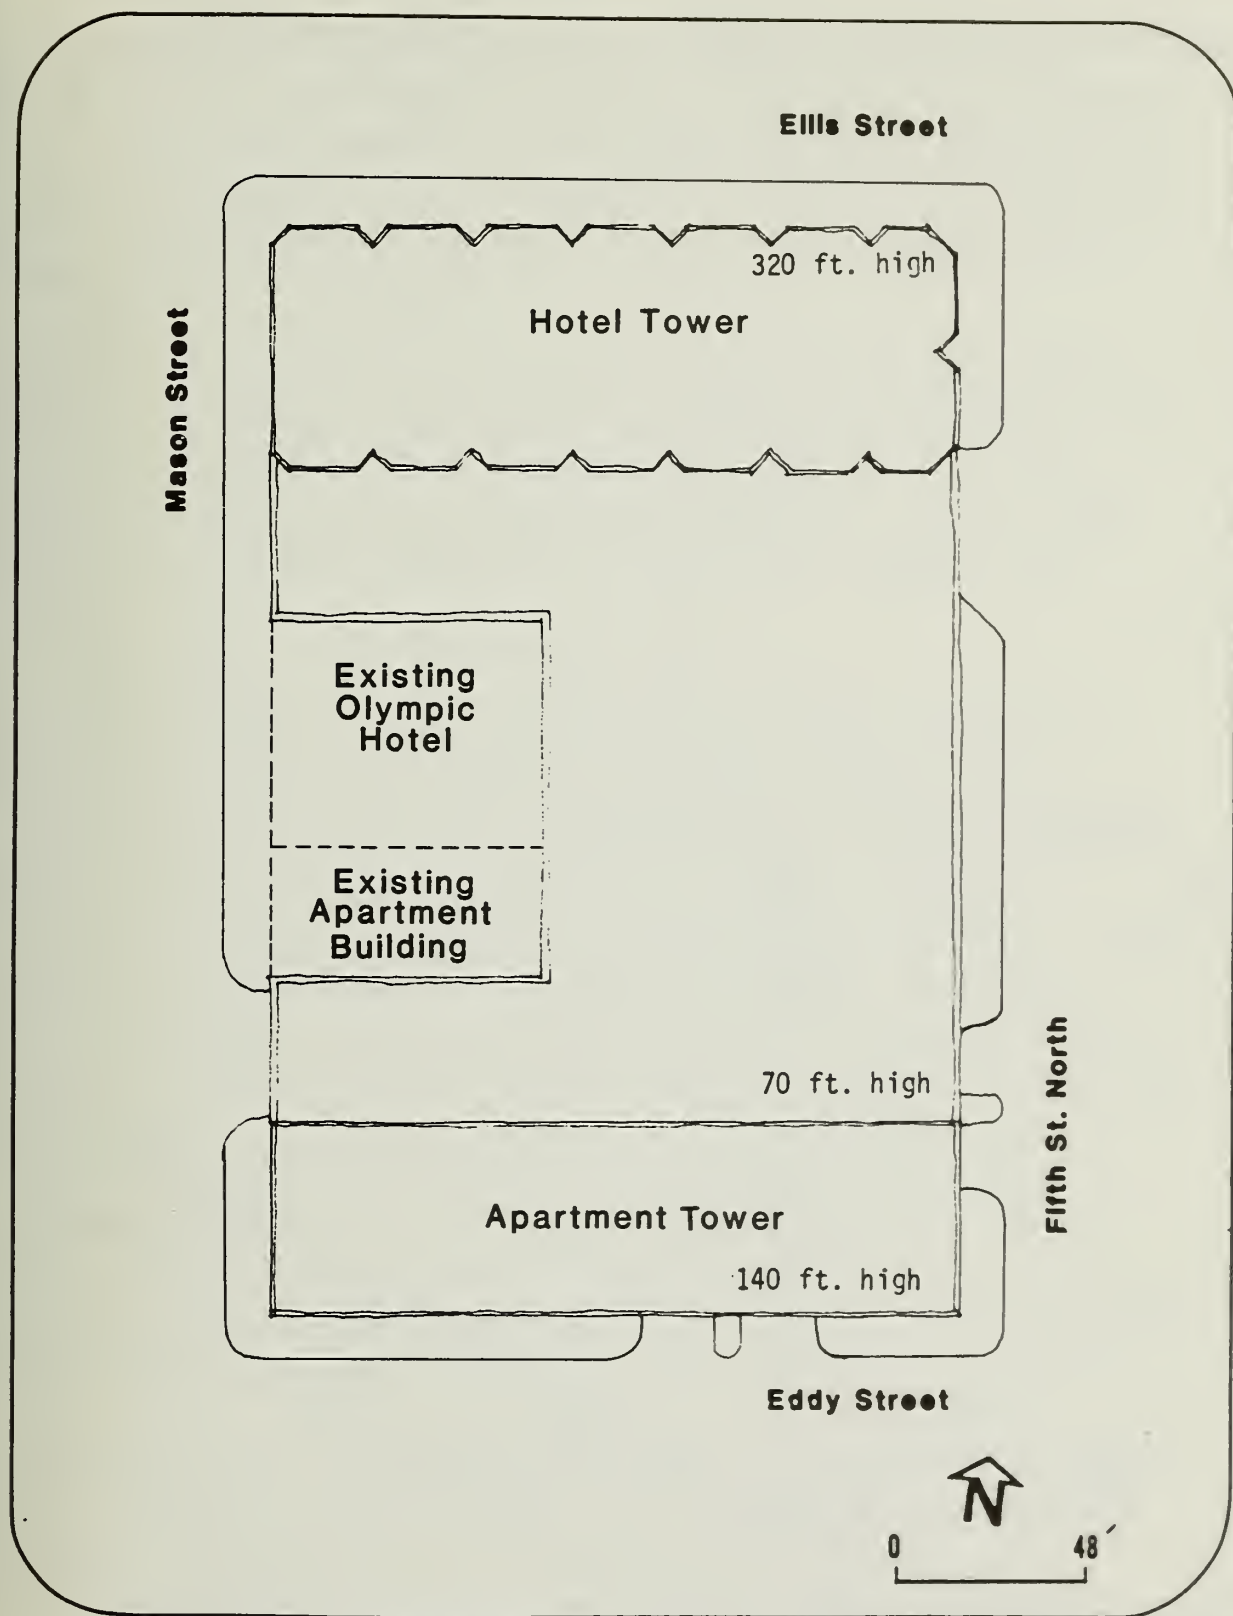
TWO-TOWER ALTERNATIVE -
